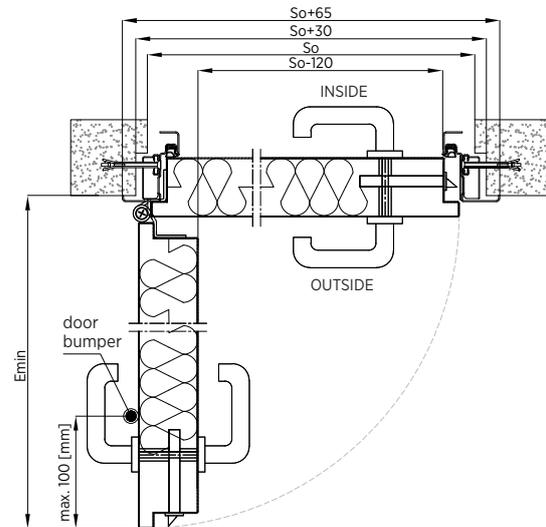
Installation of the single-leaf door in front of the opening - corner frame with a thermal break - horizontal cross-section
